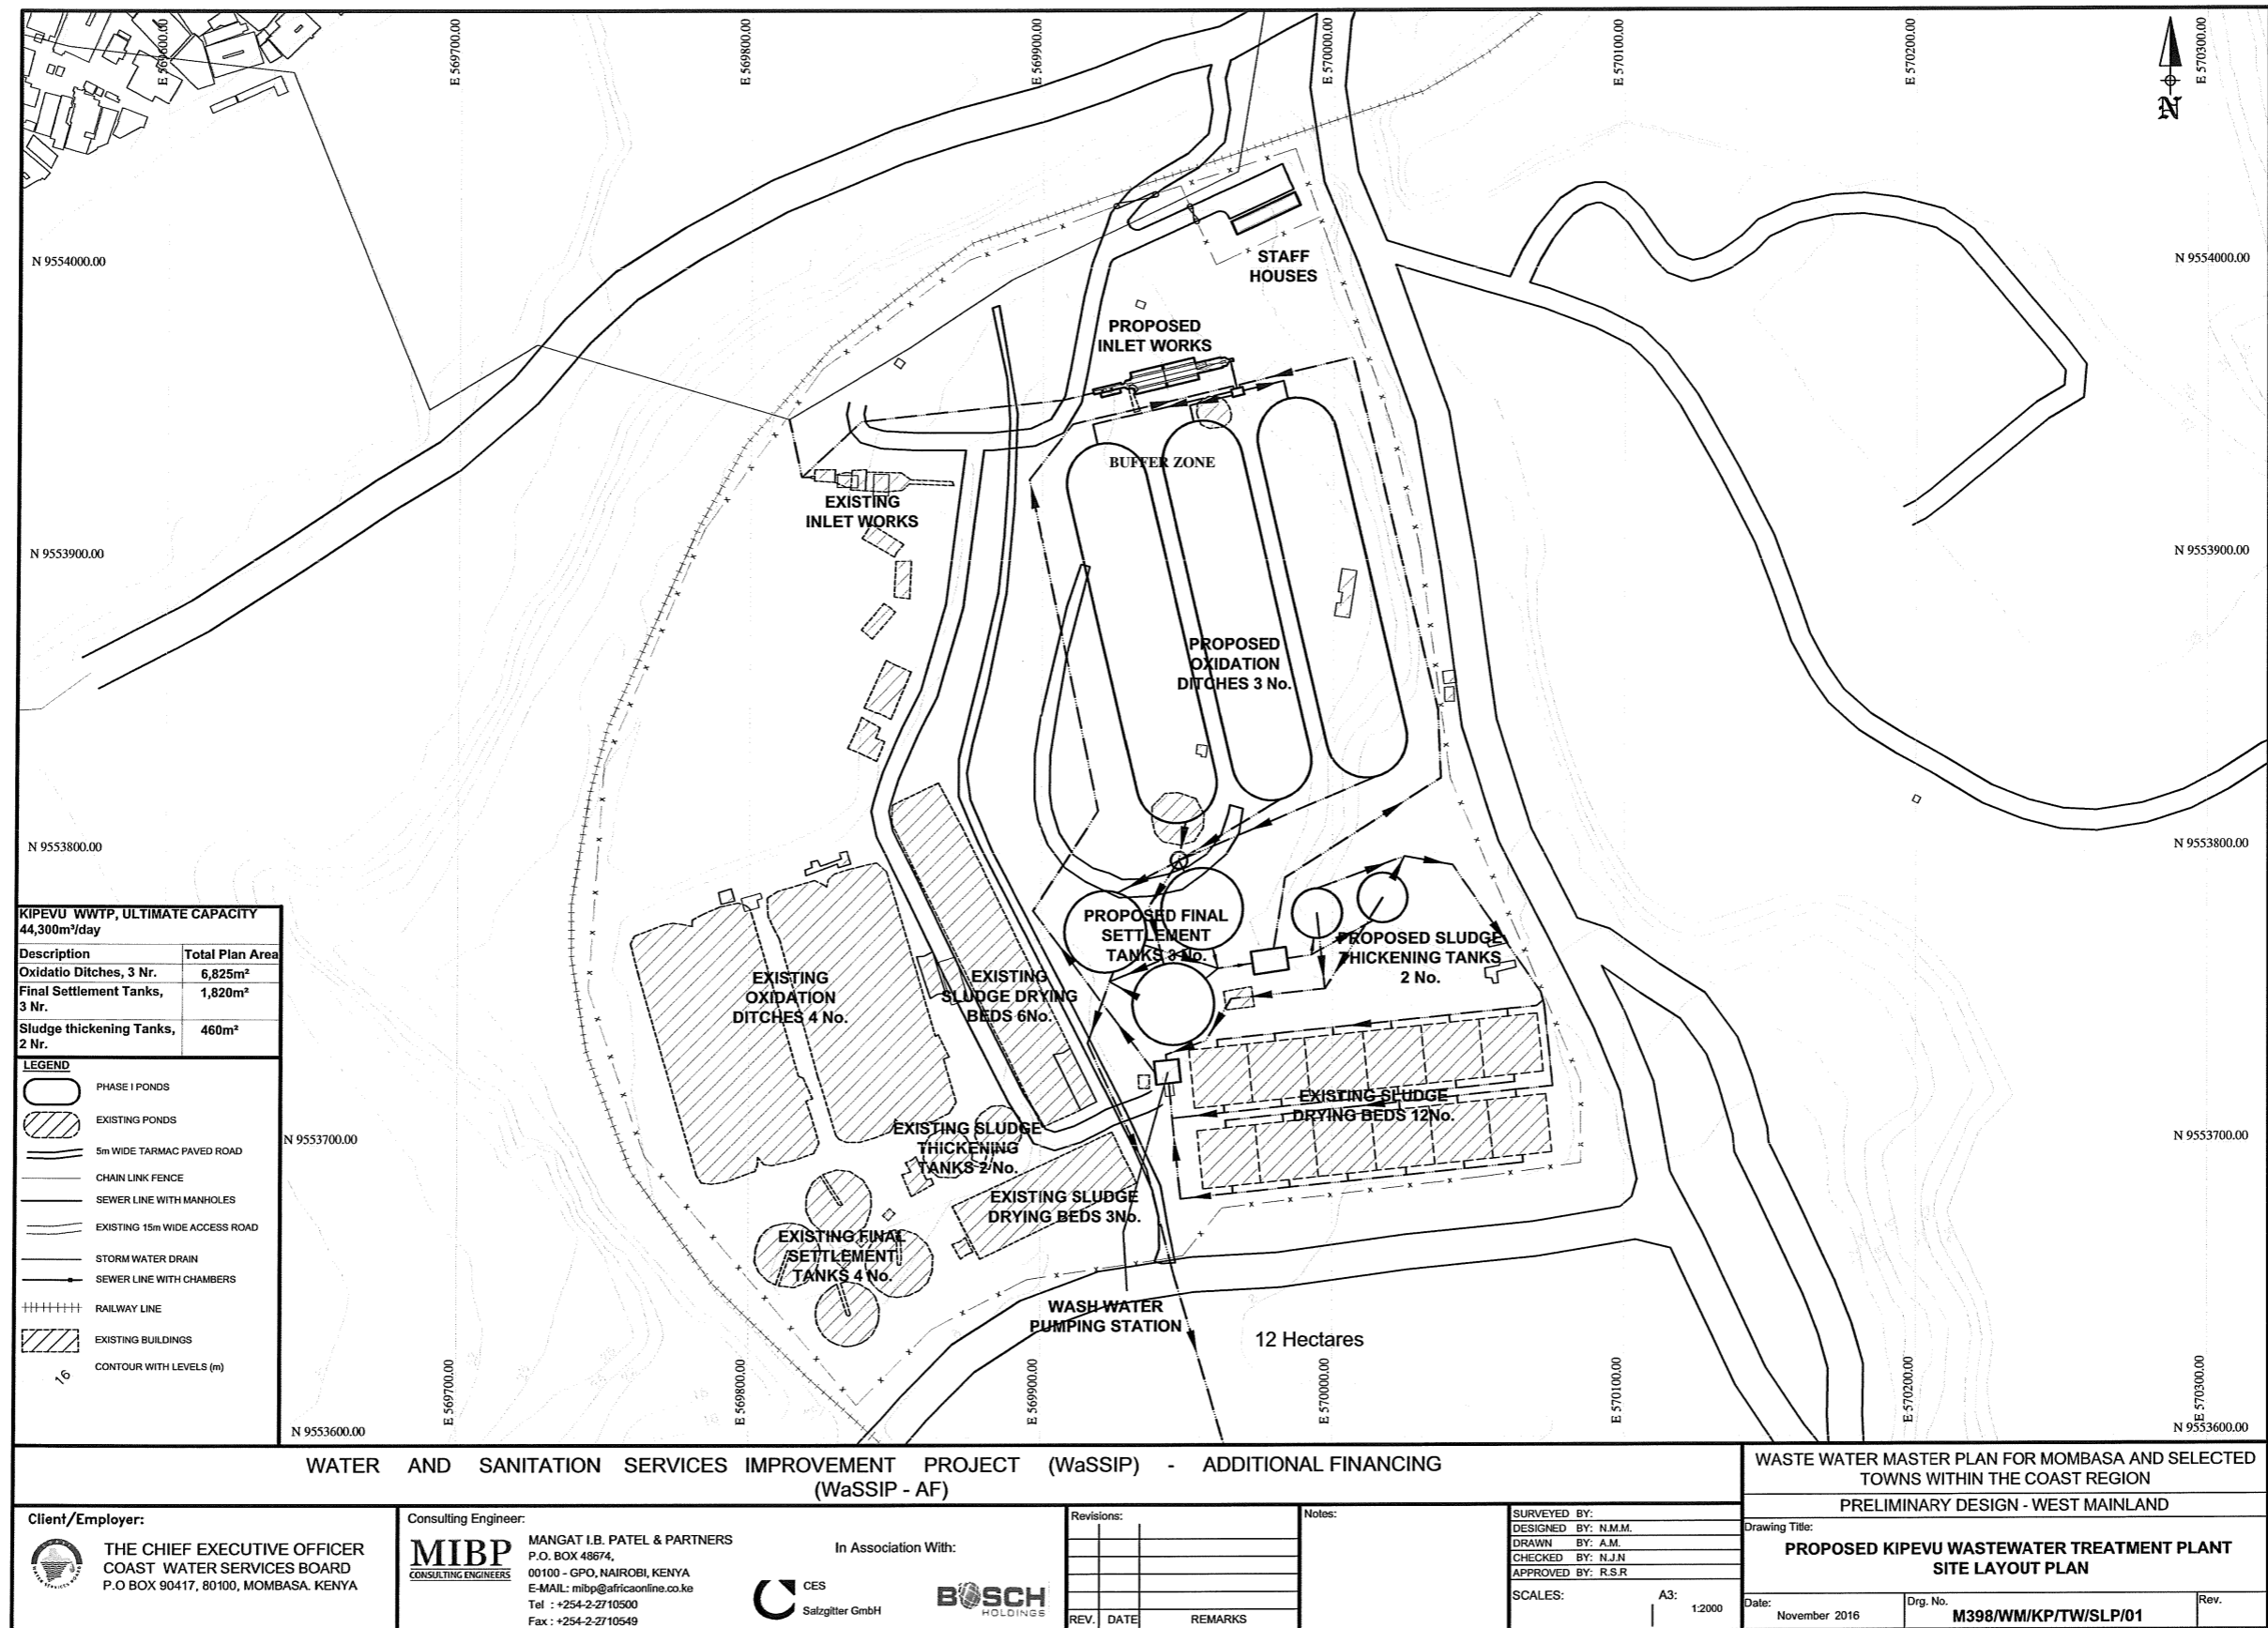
Site Layout Plan of the proposed Waste Water Treatment Plant
